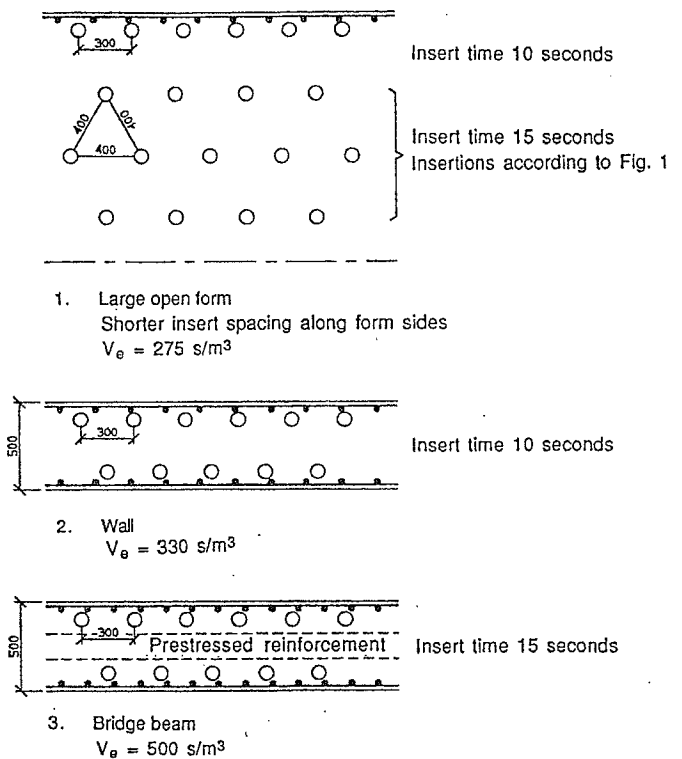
Large open form, wall, and bridge beam examples of vibration plans. Concrete had a plastic consistency when vibrated at 55-60 mm (2.25-2.5 in.).
